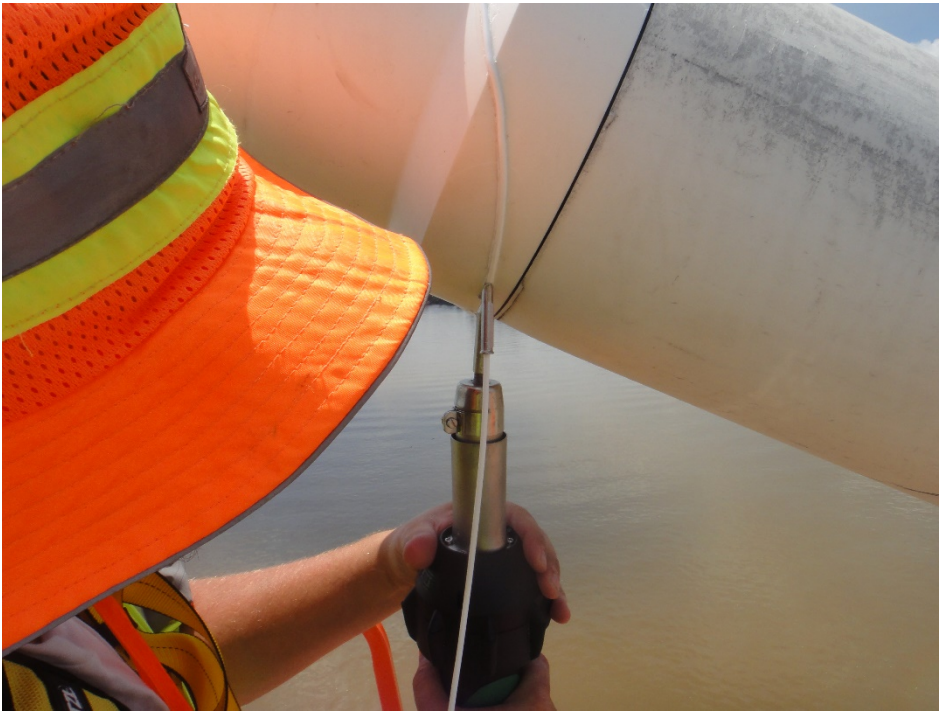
Weld Repair of Crack in Reducer at Stay Cable B23D.
